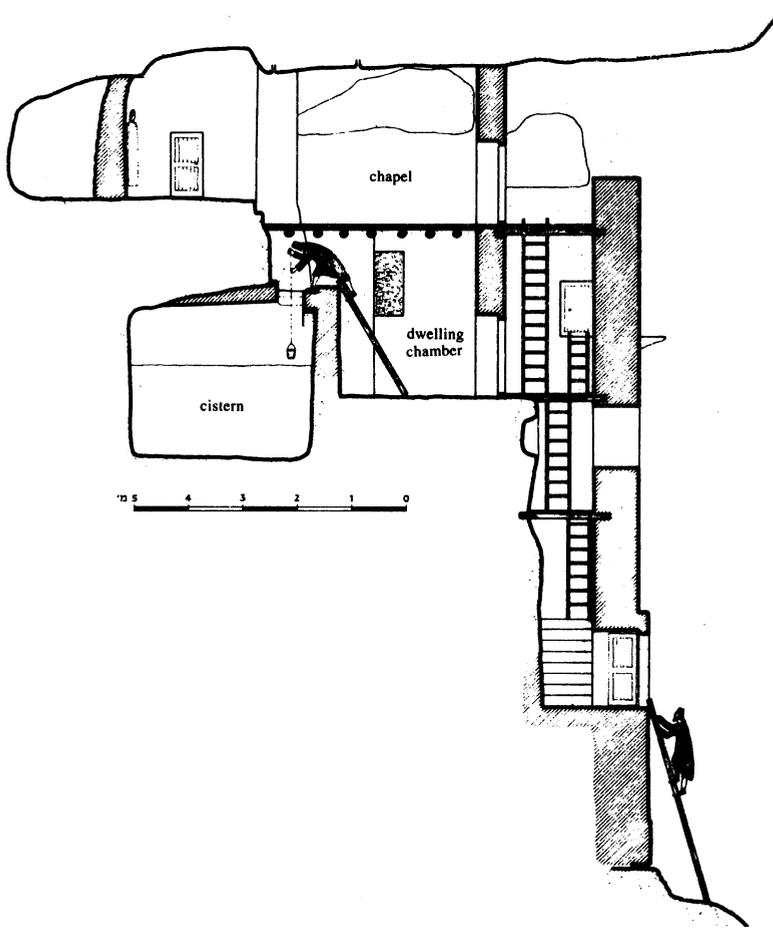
Reconstruction of hermitage along section B-B (looking southward).
